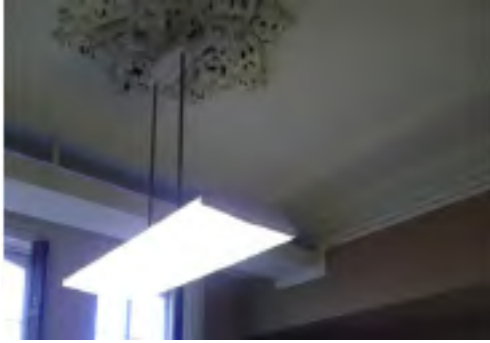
Decorative plaster ceiling in Center East Bedroom BR 303
